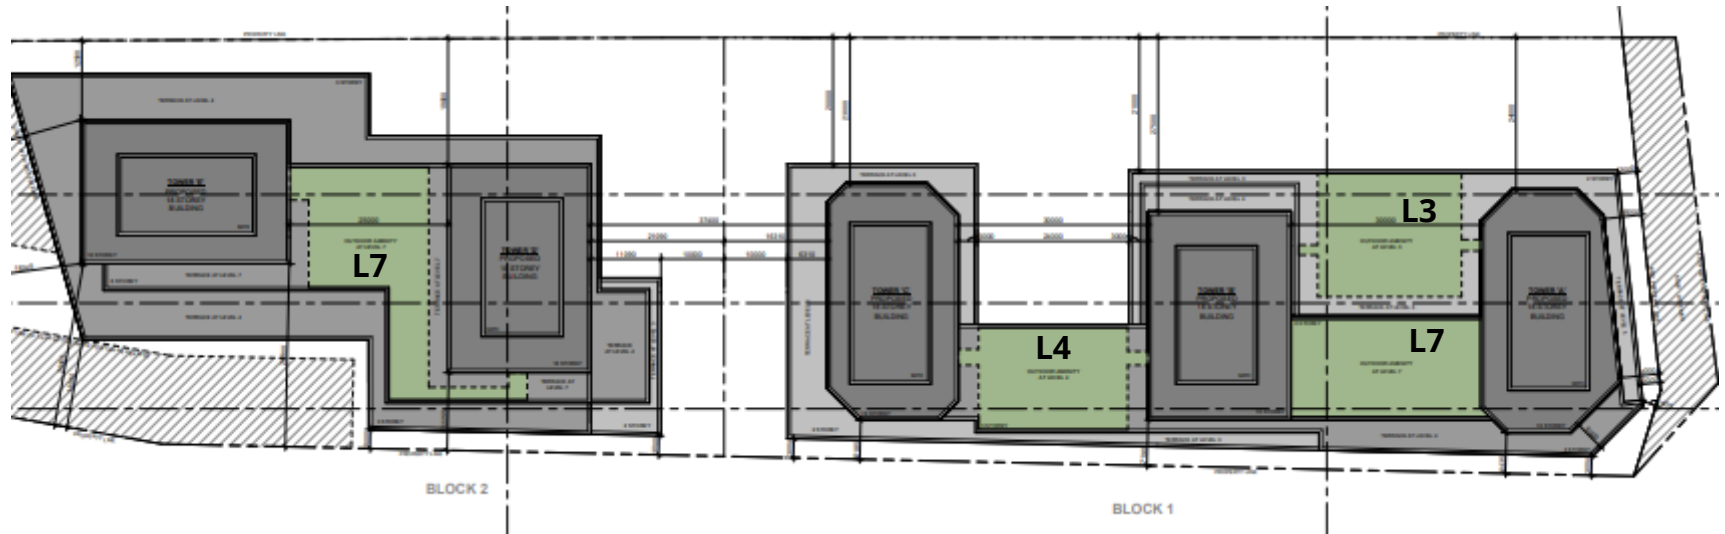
Roof plan of the proposed project showing amenity areas atop the podiums
